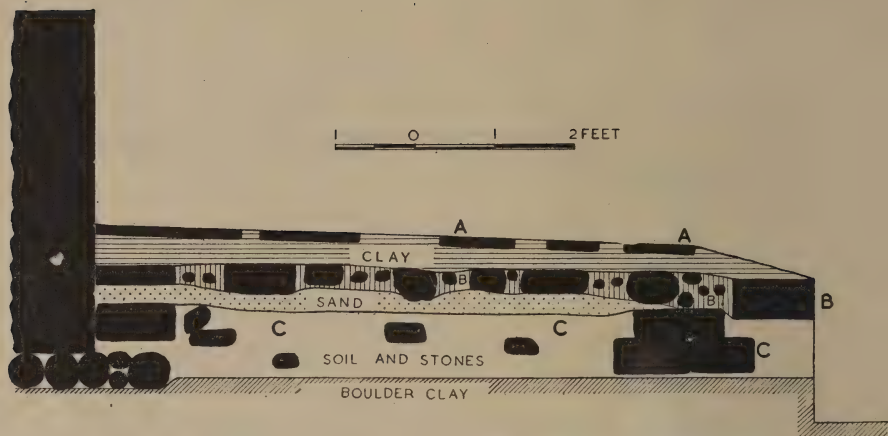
SECTION THROUGH FLOORS FROM KITCHEN WALL SOUTHWARDS
